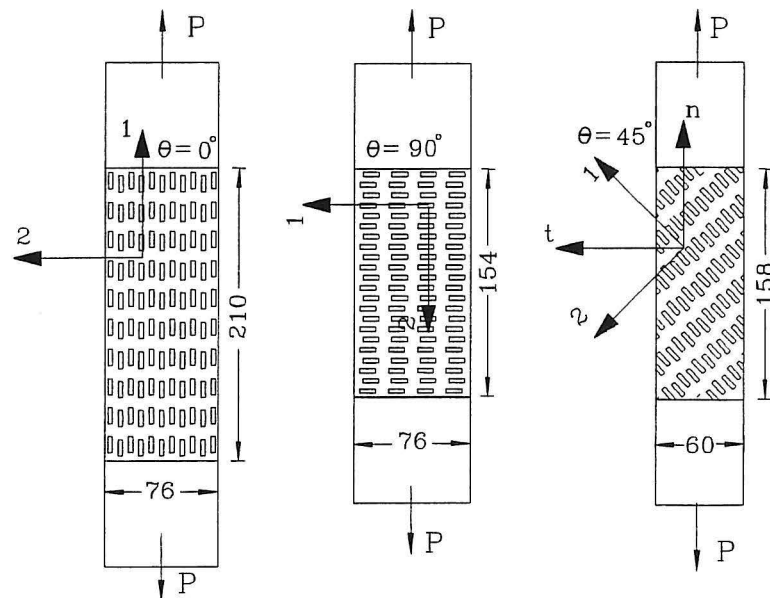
Test specimens for tensile tests. Dimensions in mm.
